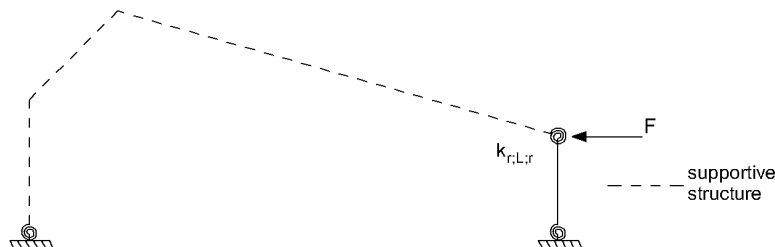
Model to determine the critical buckling load of the right-hand column (separate column approach 2)
